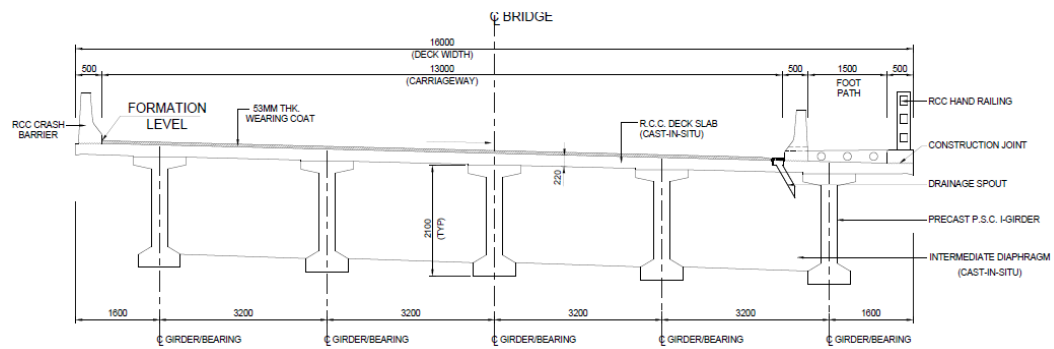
Cross section of 35m span OC post tensioned I girder at mid span
